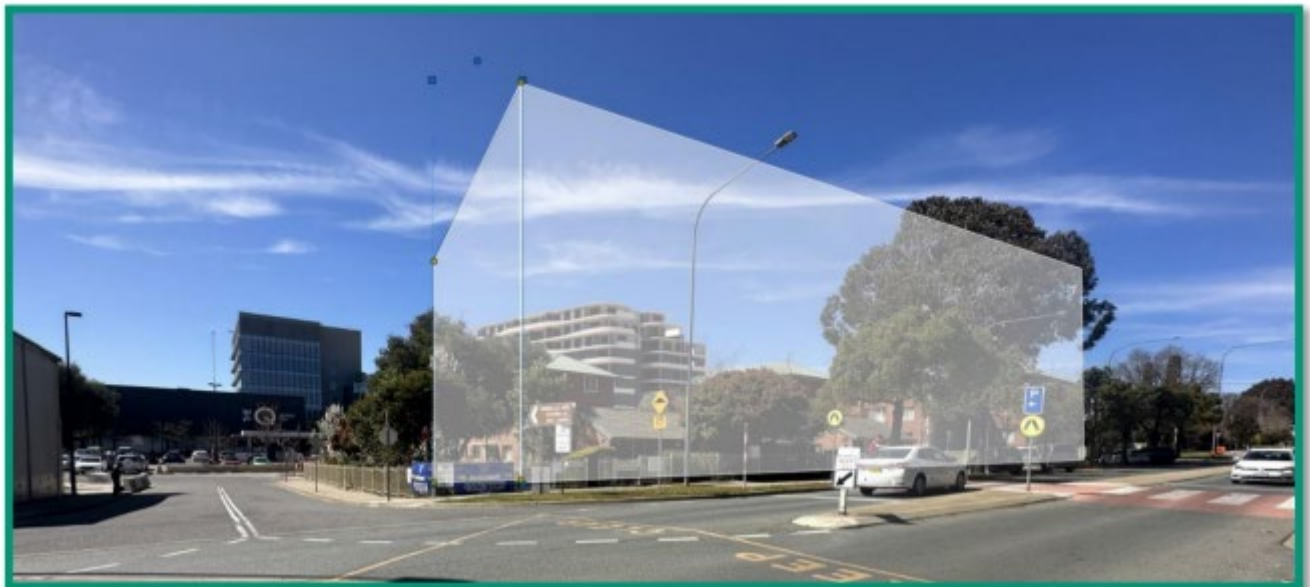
Lowe Street – showing a conservative concept for a 4-6 storey building (20m height) – source Kasperek Architects.
